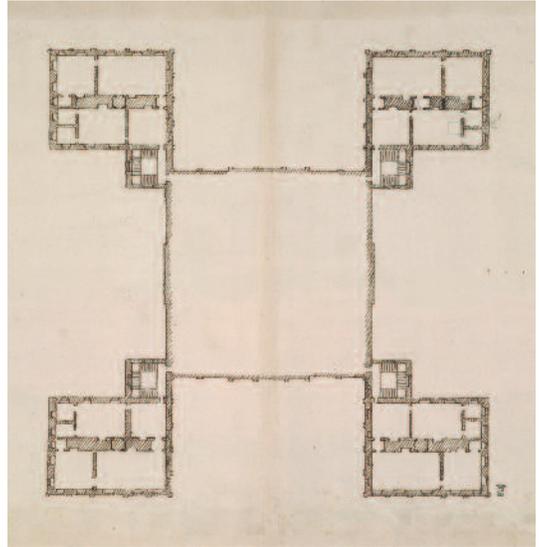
John Webb: Design for adding Four Pavilions to Queen's House, Greenwich, 1660–70.
